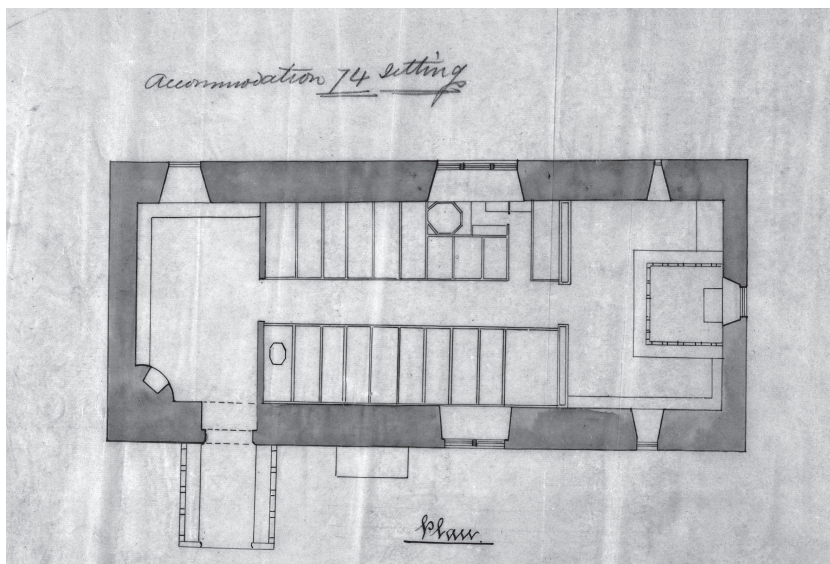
Walker's 1876 floor plan of the old church of St Anno.
